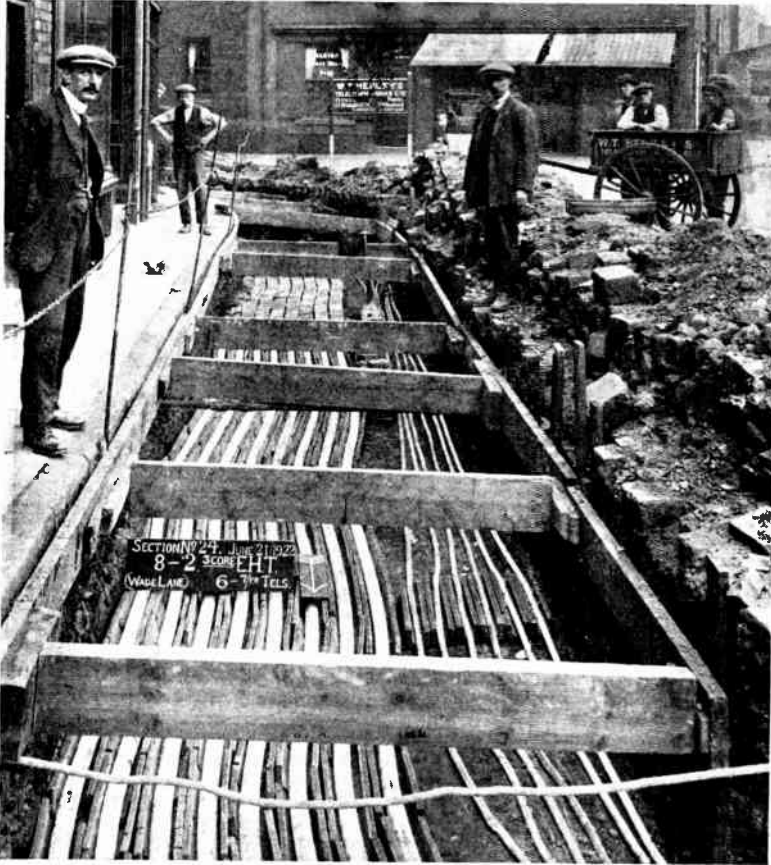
A STAGE IN LAYING OF H.T. UNDERGROUND CABLES IN CONDUITS.
